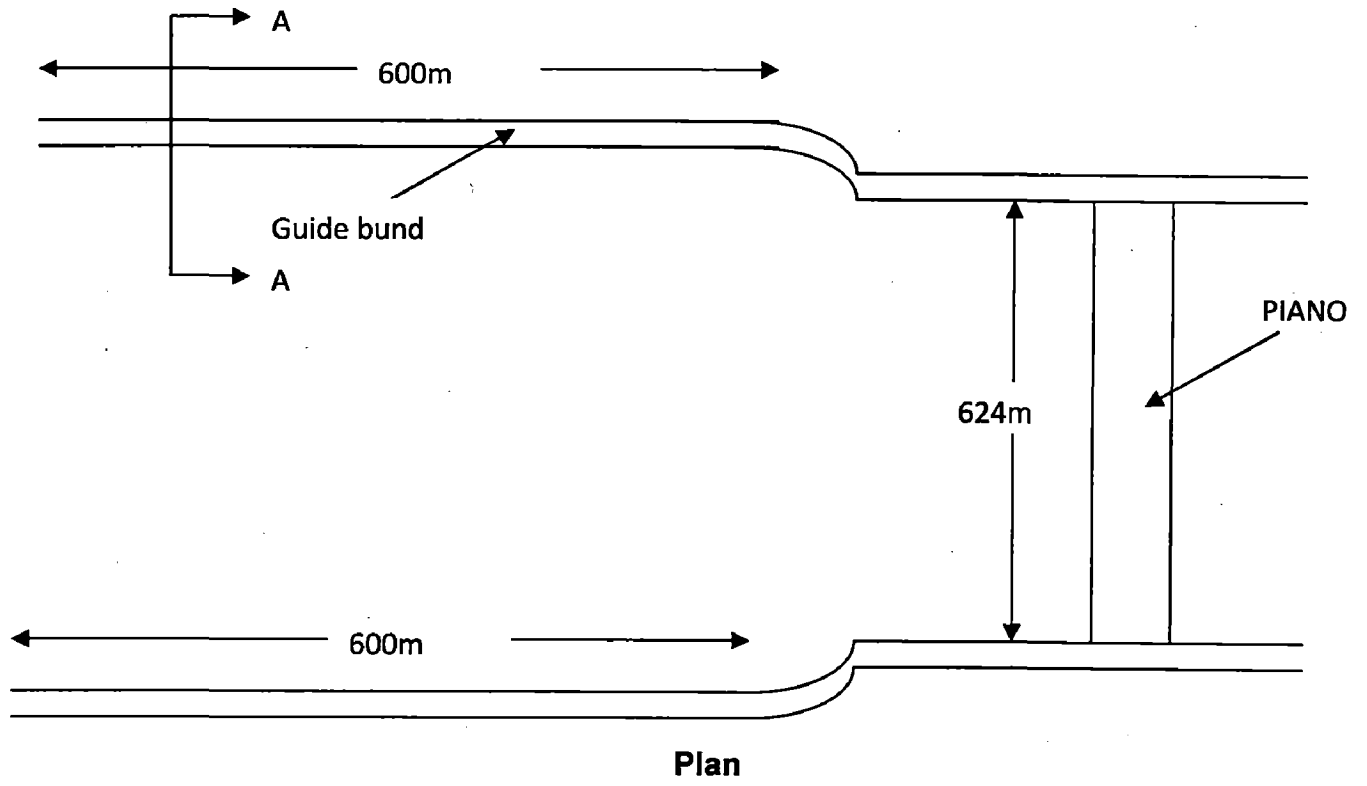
Tentative Details Showing Guide Bund Plan
